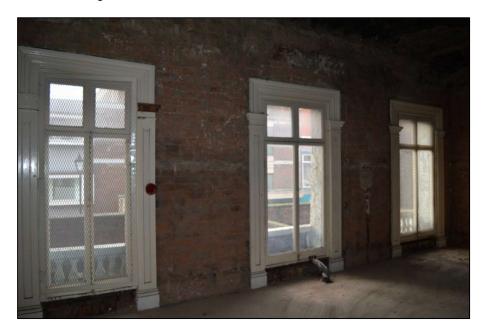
Windows in Room 6 on the first floor (CPAT 4853-0065)
